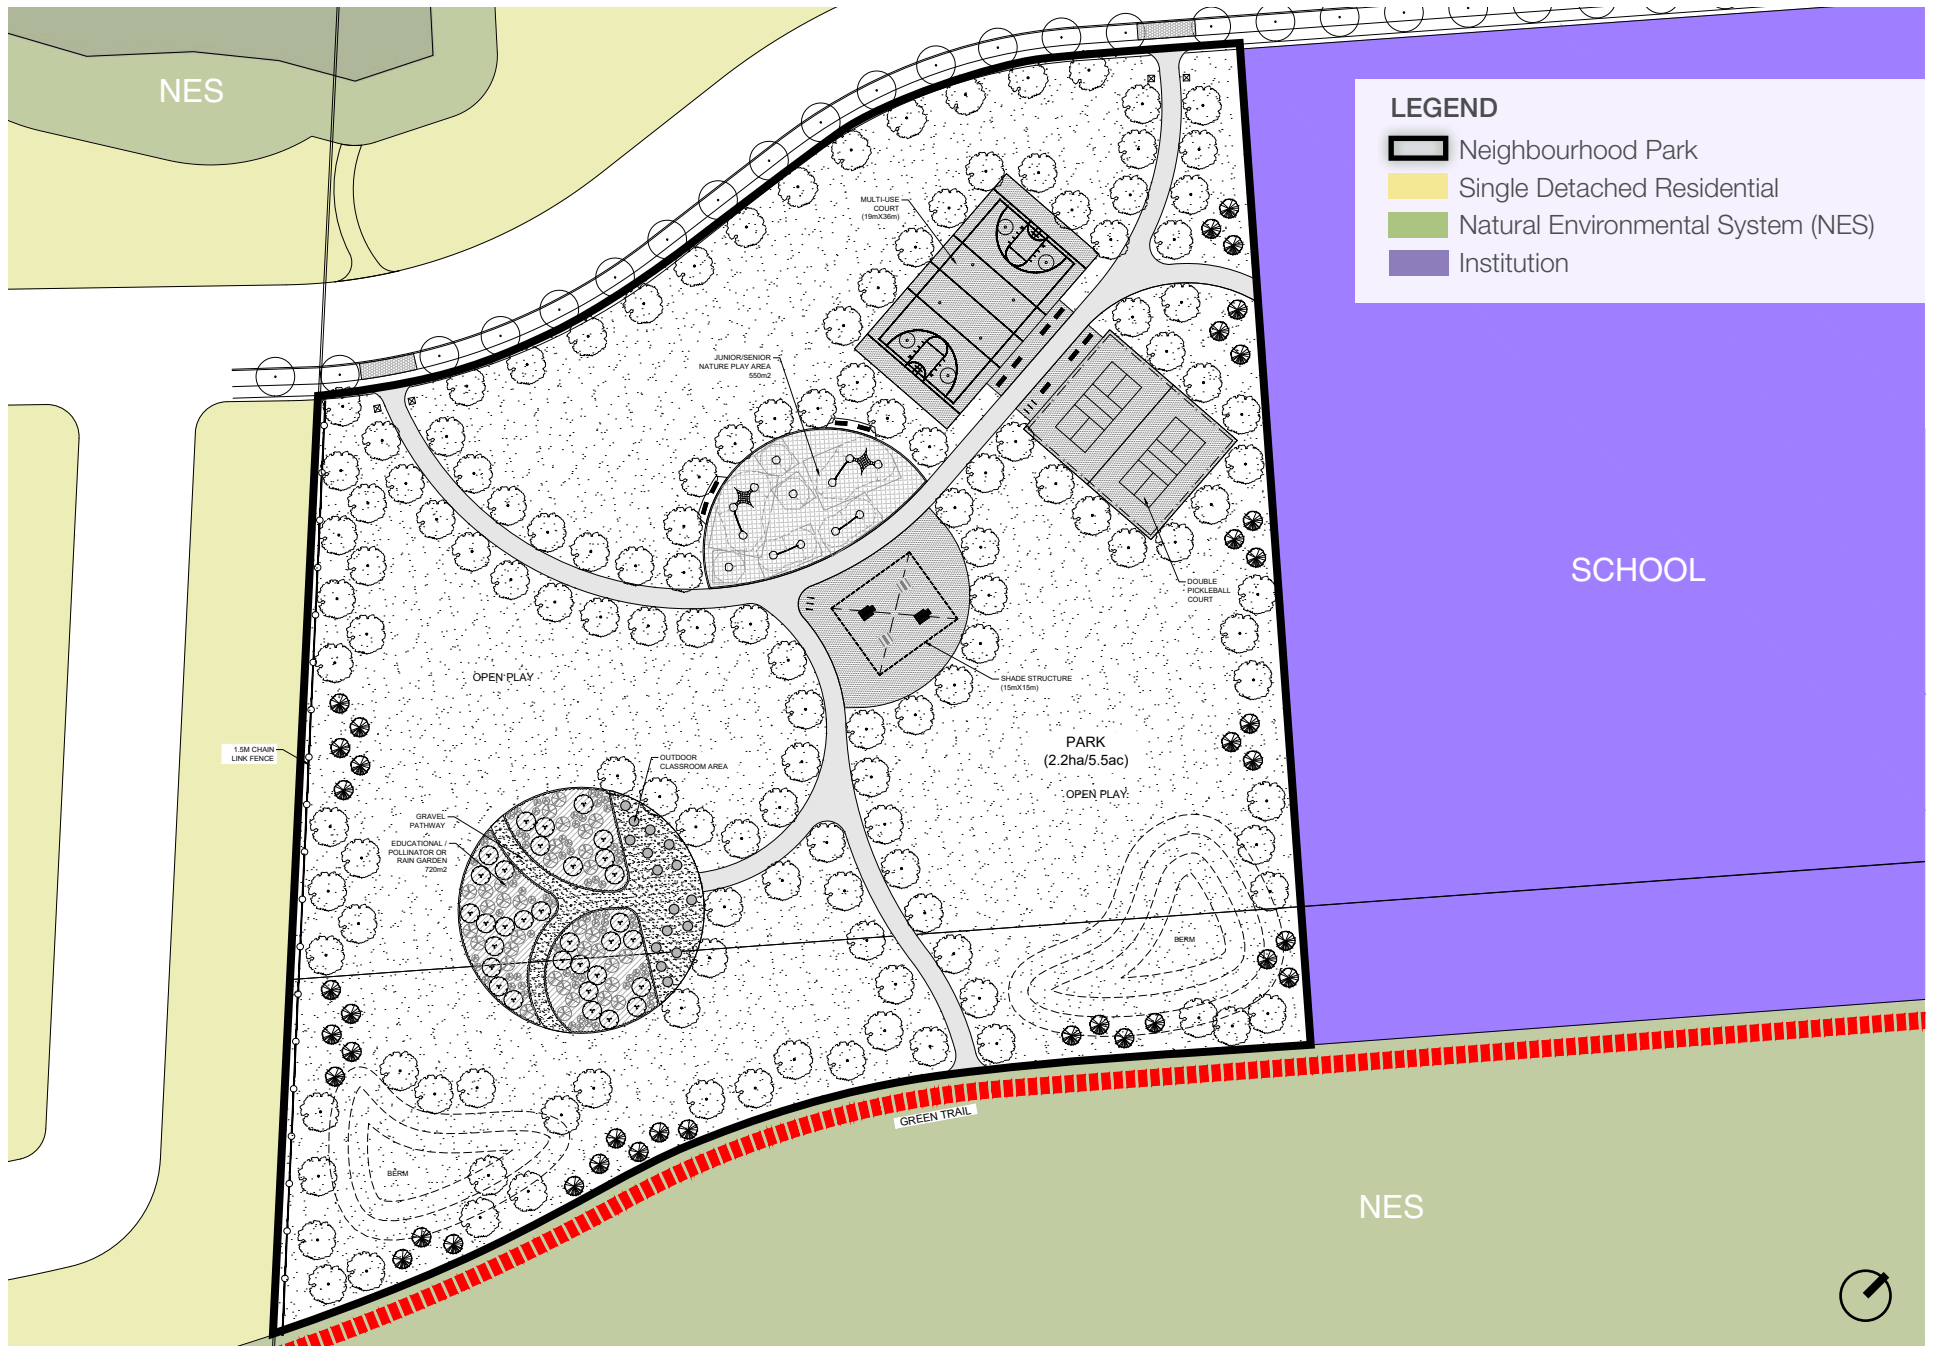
Proposed Neighbourhood Park 4 Facility Fit Plan
